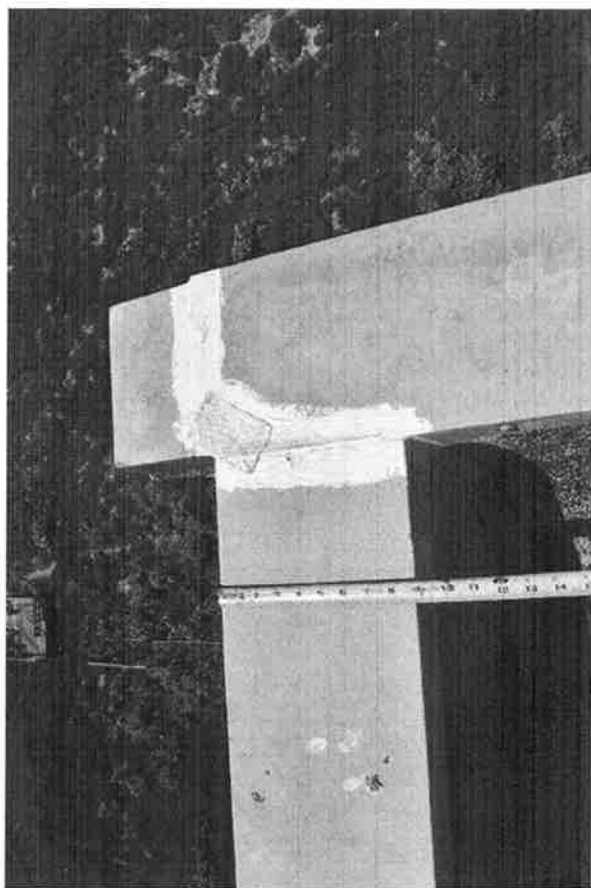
Poorly drained area and repairs to mod-bit cap sheet (typical)
